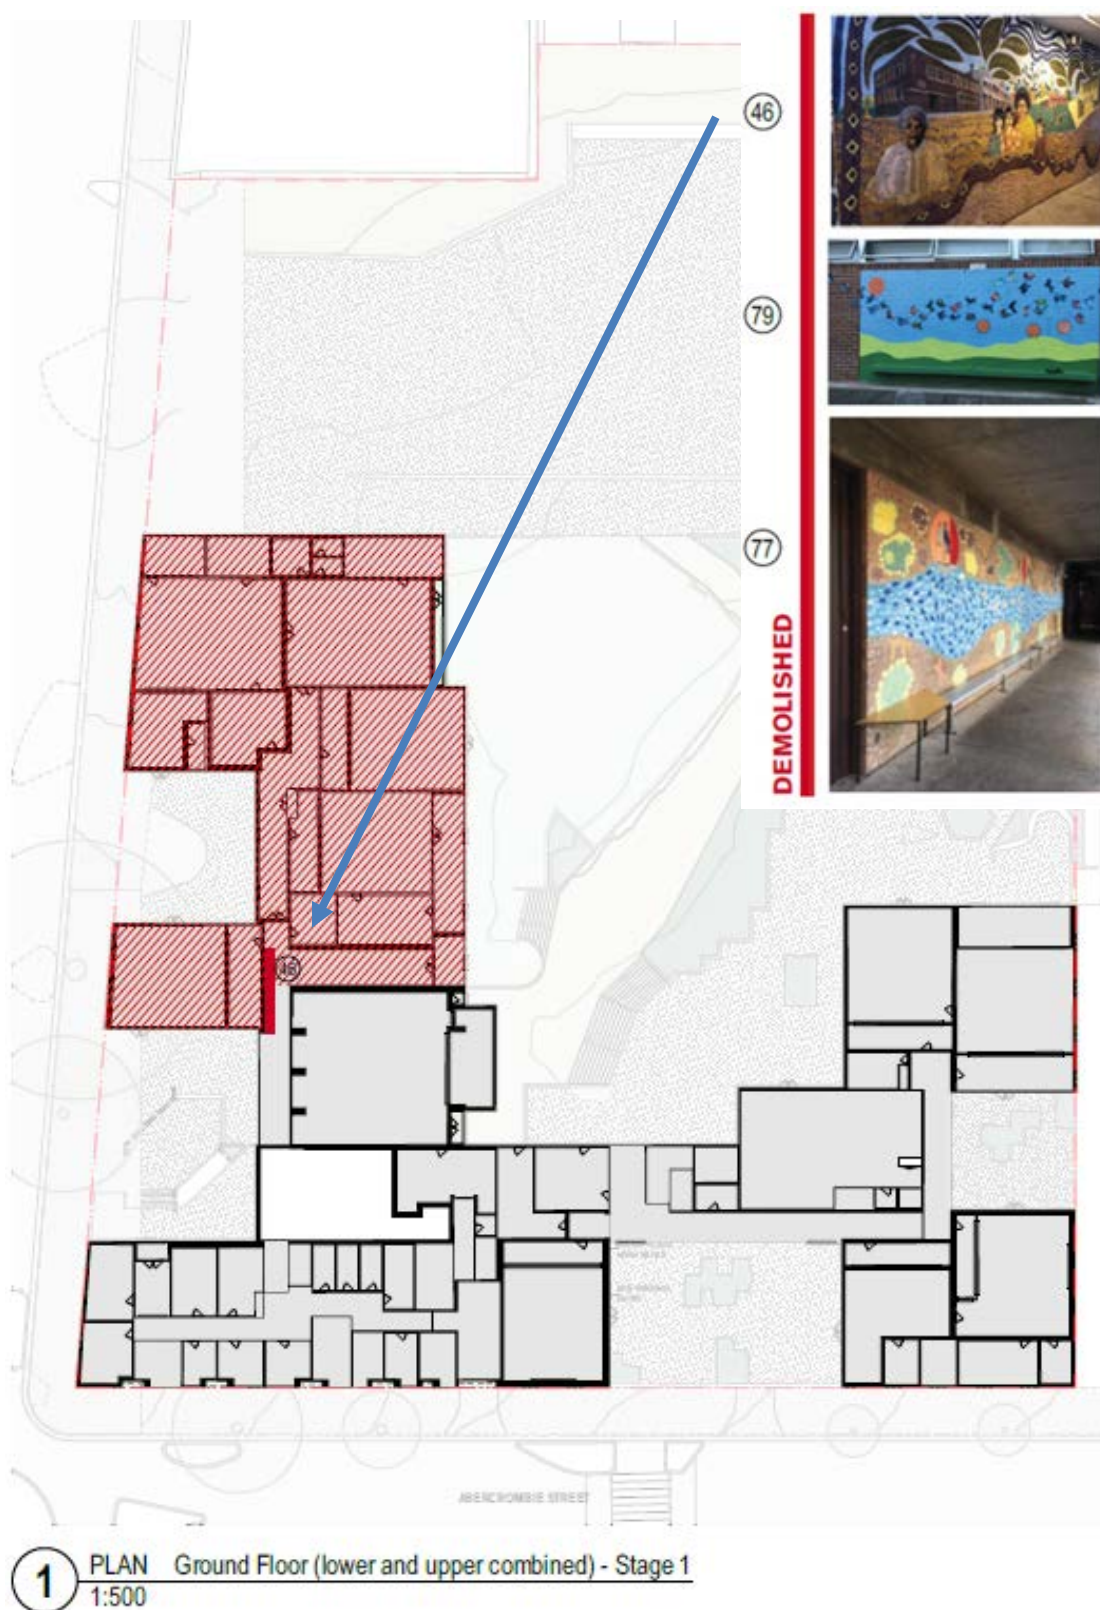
Brick Mural Demolition Plans, Stage One. (Source FJMT 2020)
